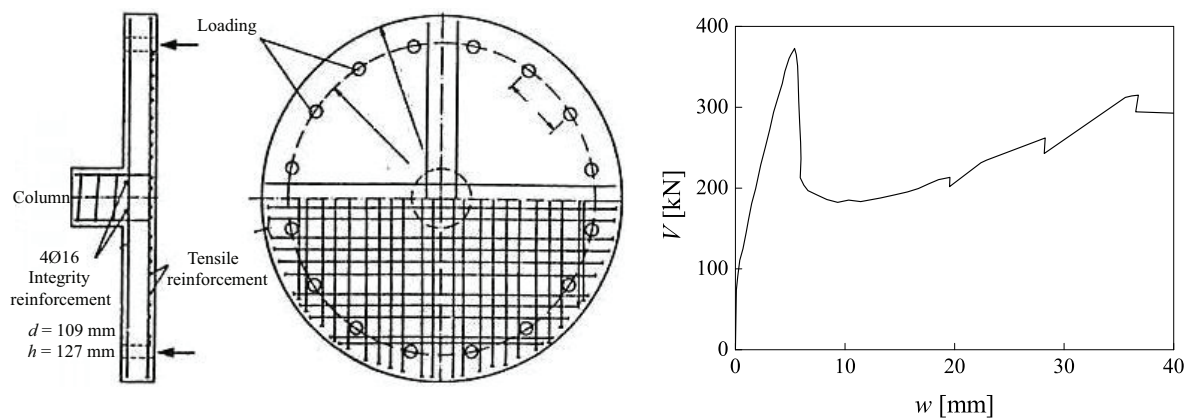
Reinforcement layout and structural response of specimen tested by Georgopoulos (1986)
